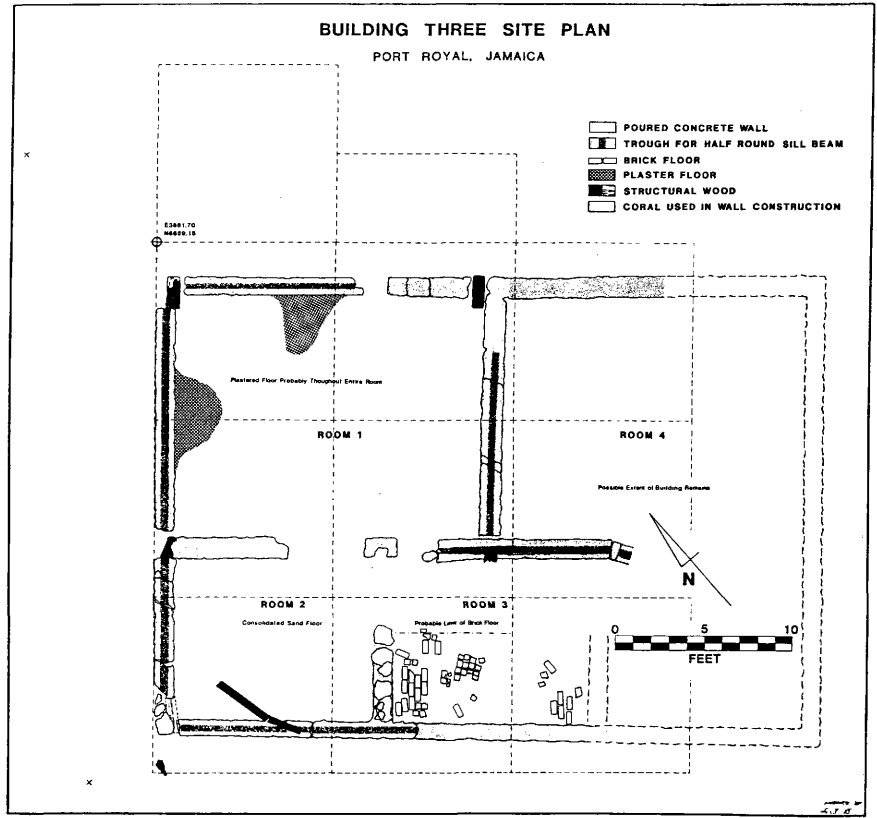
Building 3 Site Plan Courtesy of Port Royal Project
